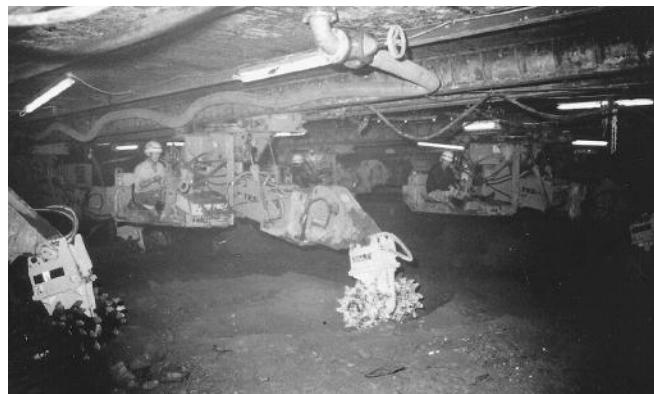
Excavating within the pressurized working chamber of the pneumatic caisson for the Rainbow Suspension Bridge. (Courtesy of Shiraishi Corporation, Japan.)
